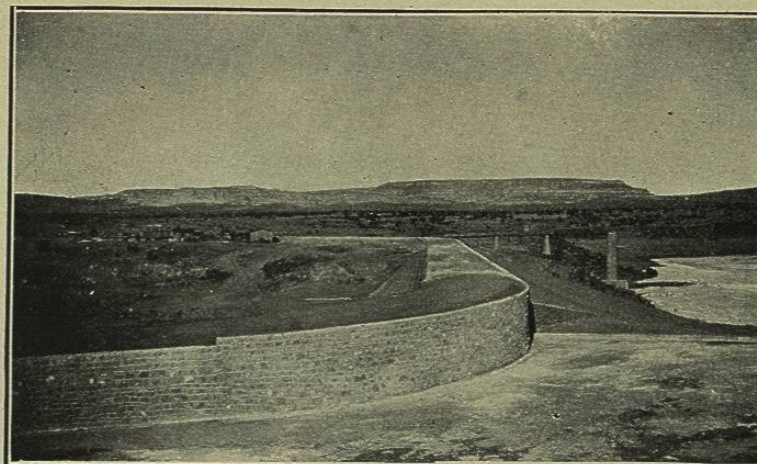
ZUÑI DAM, N. M., LOOKING NORTH, SHOWING TOWER AND BRIDGE IN DISTANCE, SPILLWAY GUARD-WALL IN FOREGROUND.
